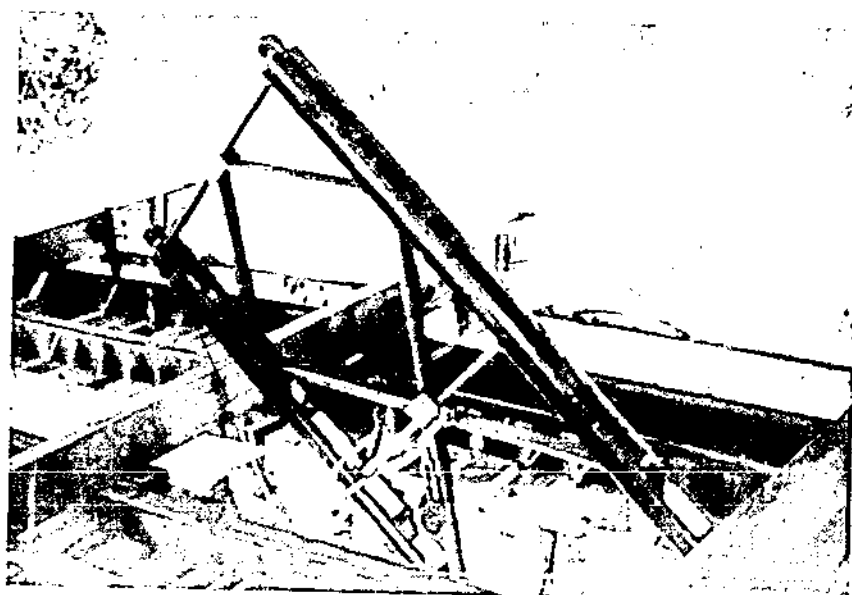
Bailey panel being lowered from the old bridge. Note the tackle from outside of the bridge is used to take the weight of the panel as it is lowered and to position it sideways
